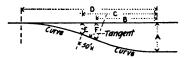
Method of Laying Out Temporary Track or "Run-Around" at a Washout or Wreck; Southern Pacific Ry.
